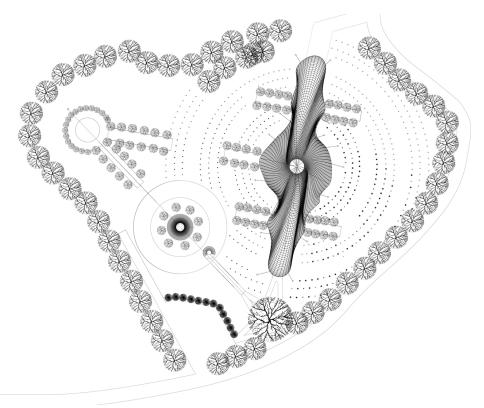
| DESIGN PLAN | JOSH TROJAN
